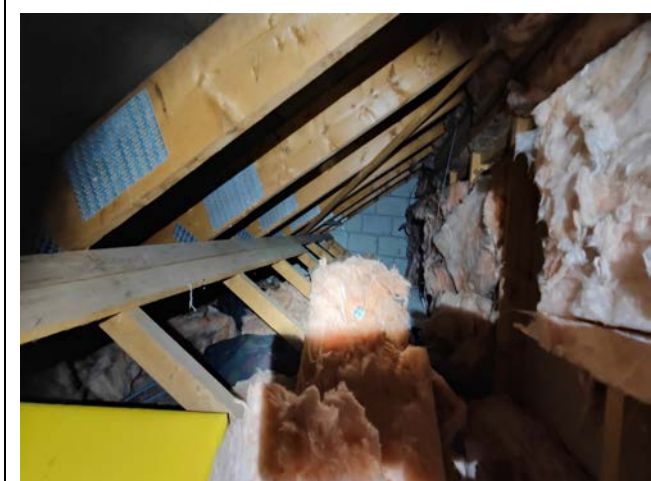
The internal space within roof void 1 of the main building of the day centre.
